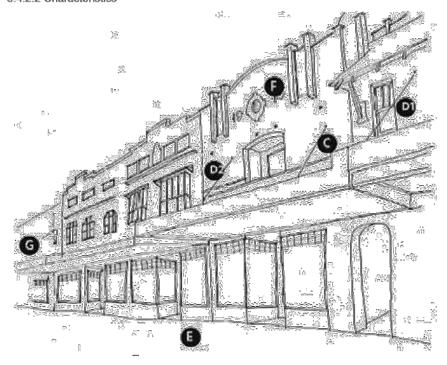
Primary defining elements of a heritage shopfronts including: C) recessed balconies; D1) window patterns, proportions and details; D2) bay windows; E) shopfronts; F) parapets profiles and details; and G) awning alignment, stays, fascias and soffits (Source: Marrickville DCP 2011, Part 5 - Commercial and Mixed-use Development, p.34)
